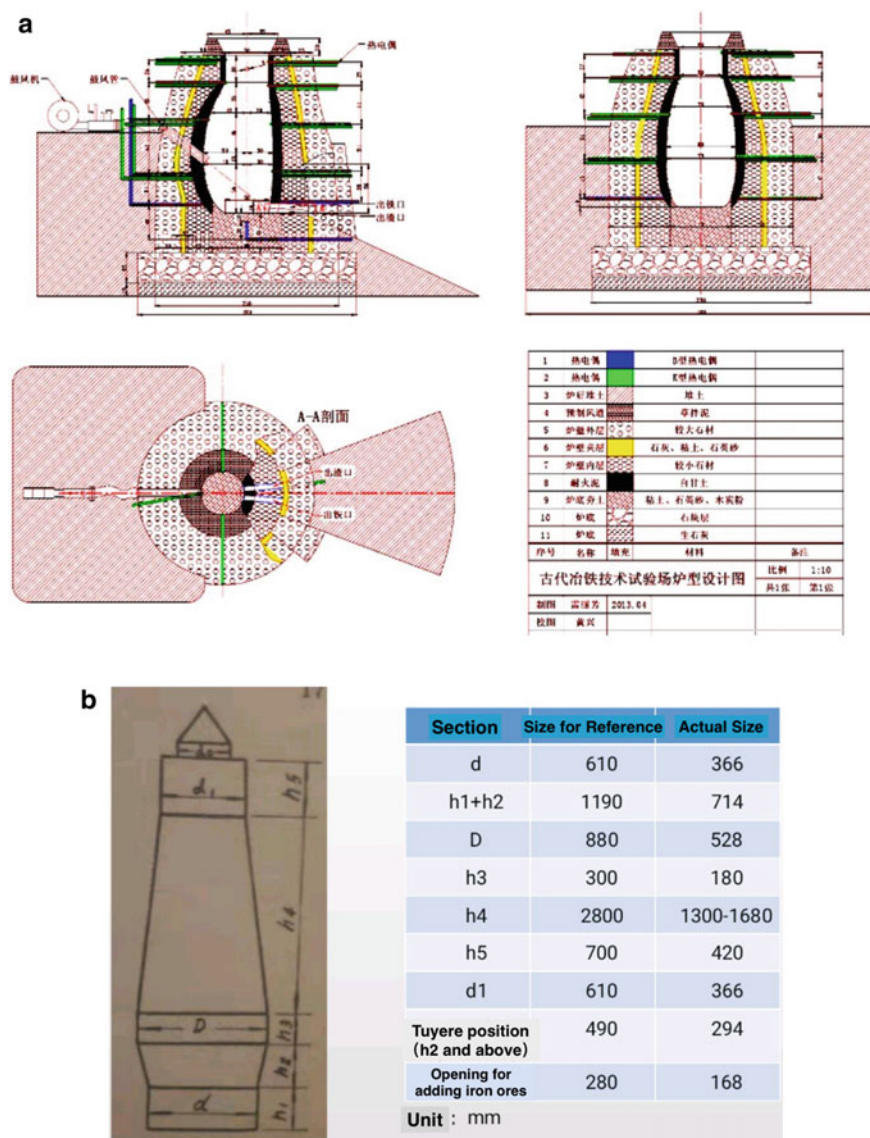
Layout drawing of a traditional iron-smelting shaft furnace
